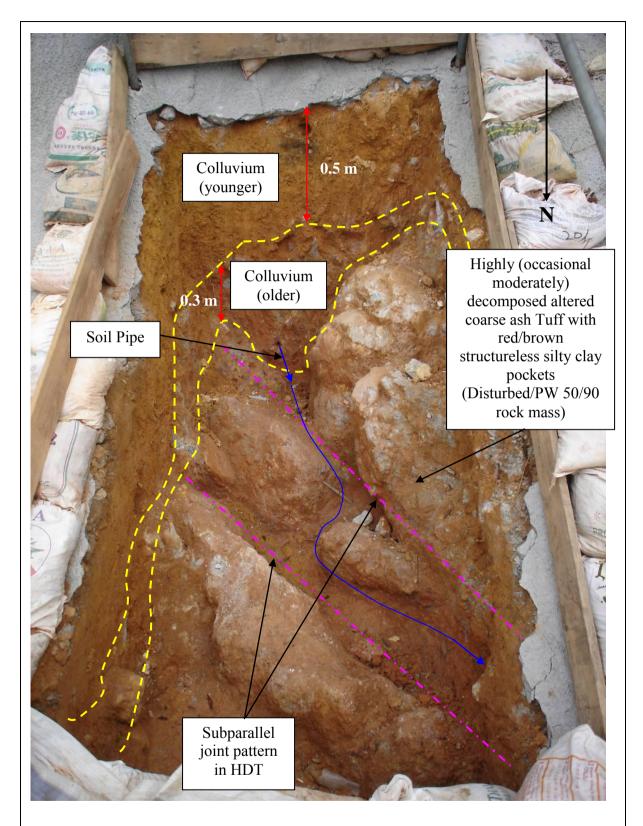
Trial Trench TTH1 Showing Two Layers of Colluvium Overlying HDT (Photograph taken on 10 October 2008)
